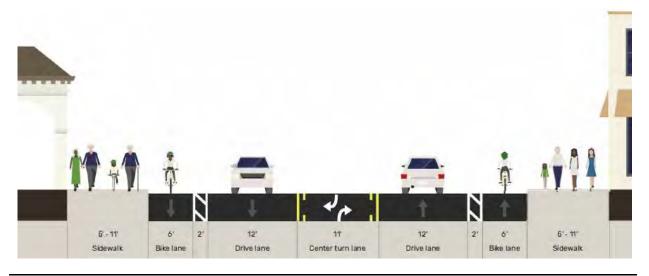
NE 3rd Street: Buffered Bike Lanes and Sidewalk Infill Concept
